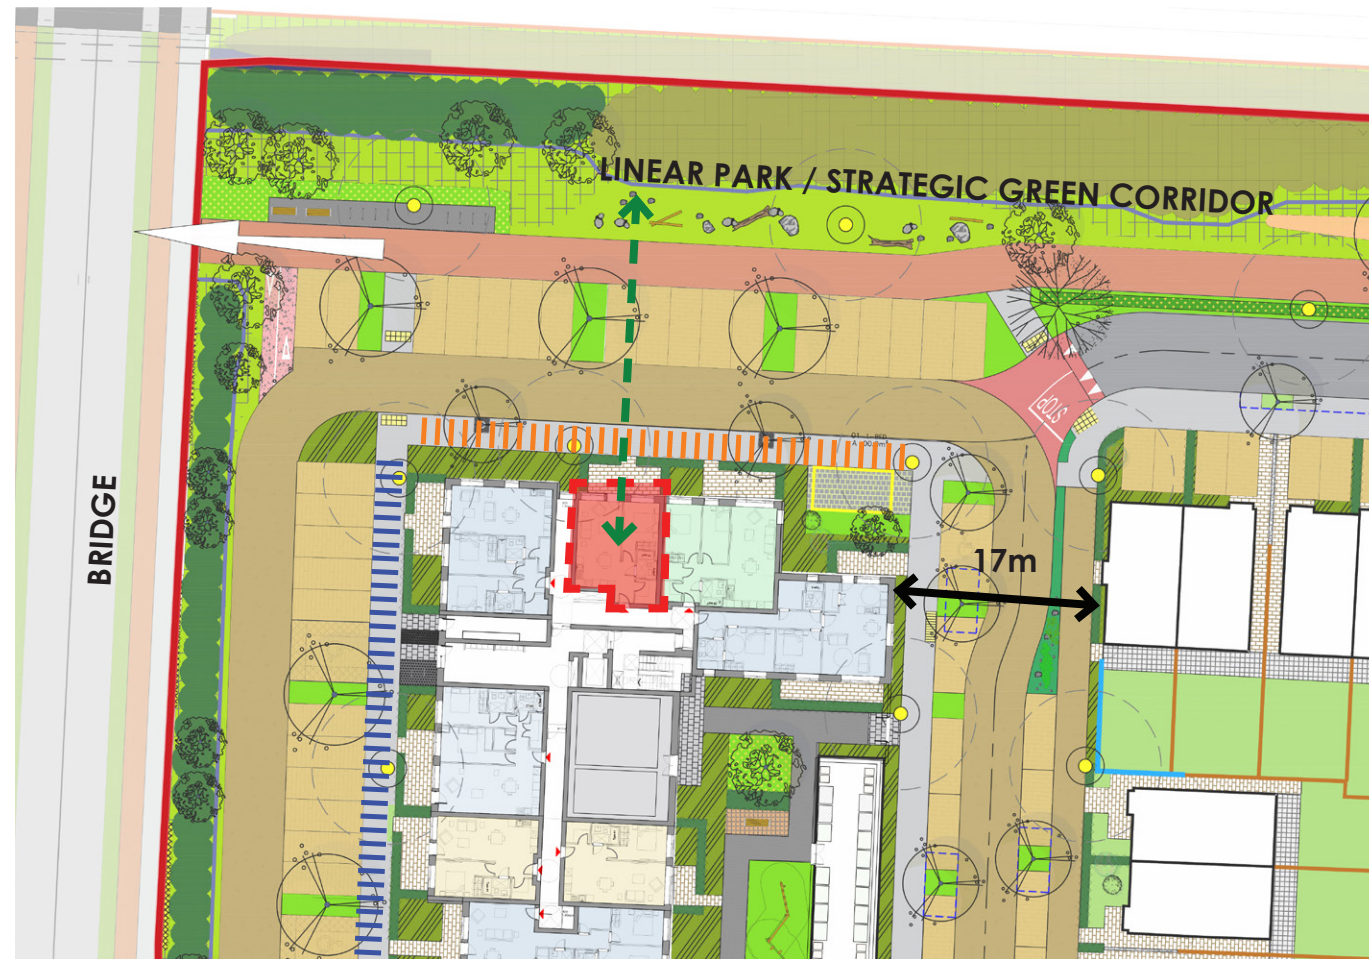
NORTH FACING APARTMENT - GROUND FLOOR PLAN PREVIOUS SUBMISSION
